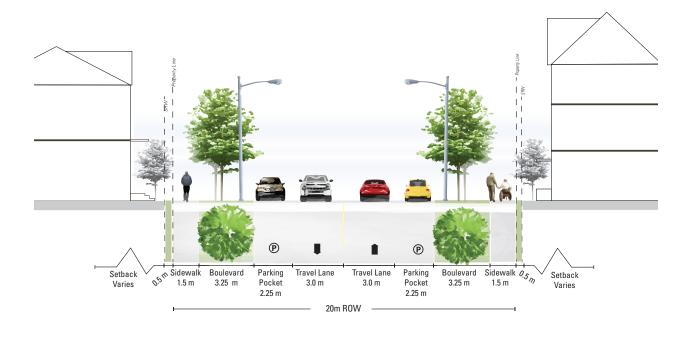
19A Avenue Cross Section - 20 m Road Allowance
